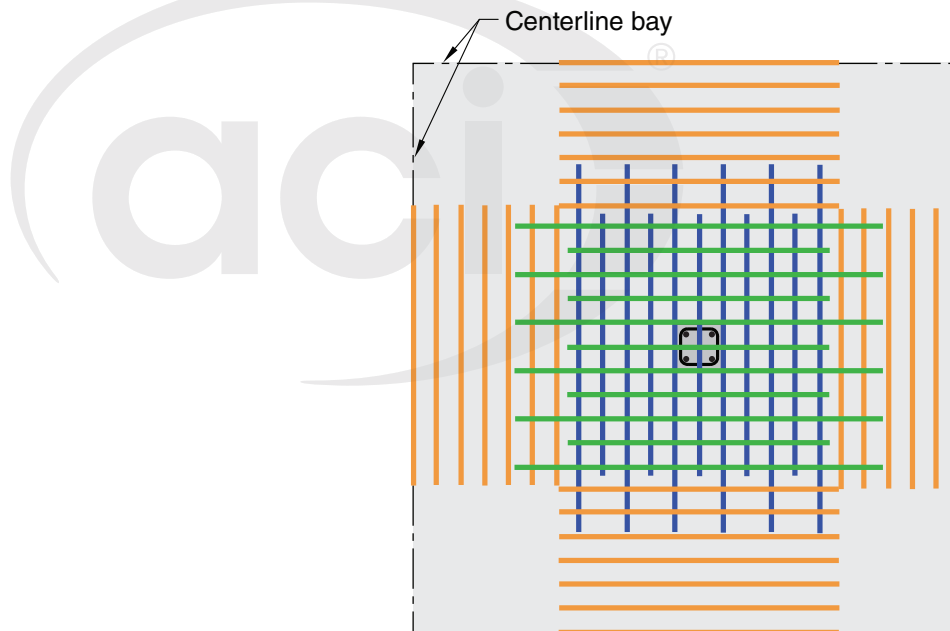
Arrangement of minimum reinforcement near the top of a two-way slab.
